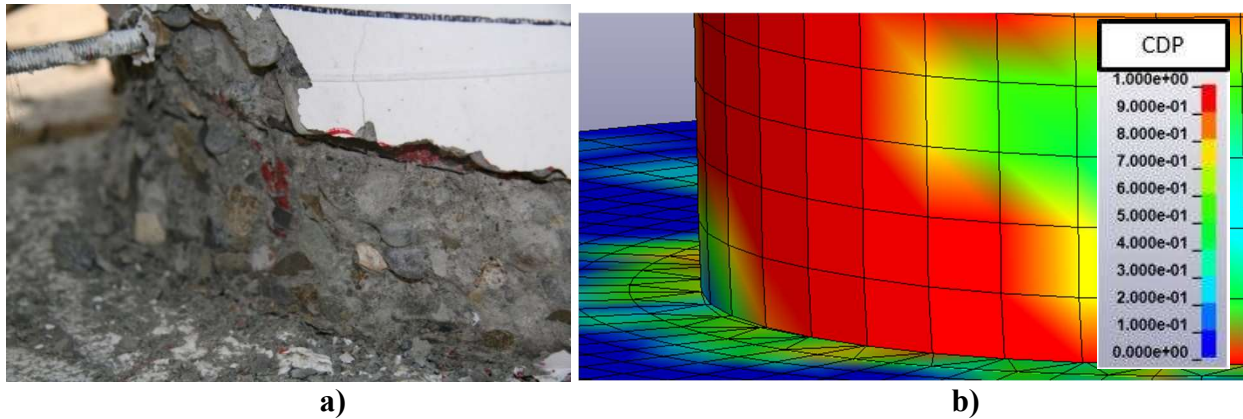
Specimen 48-21 Exposed Reinforcement and Compressive Damage at Base of Northern Column Face at 4.2% Drift: a) Observed and b) Simulated
